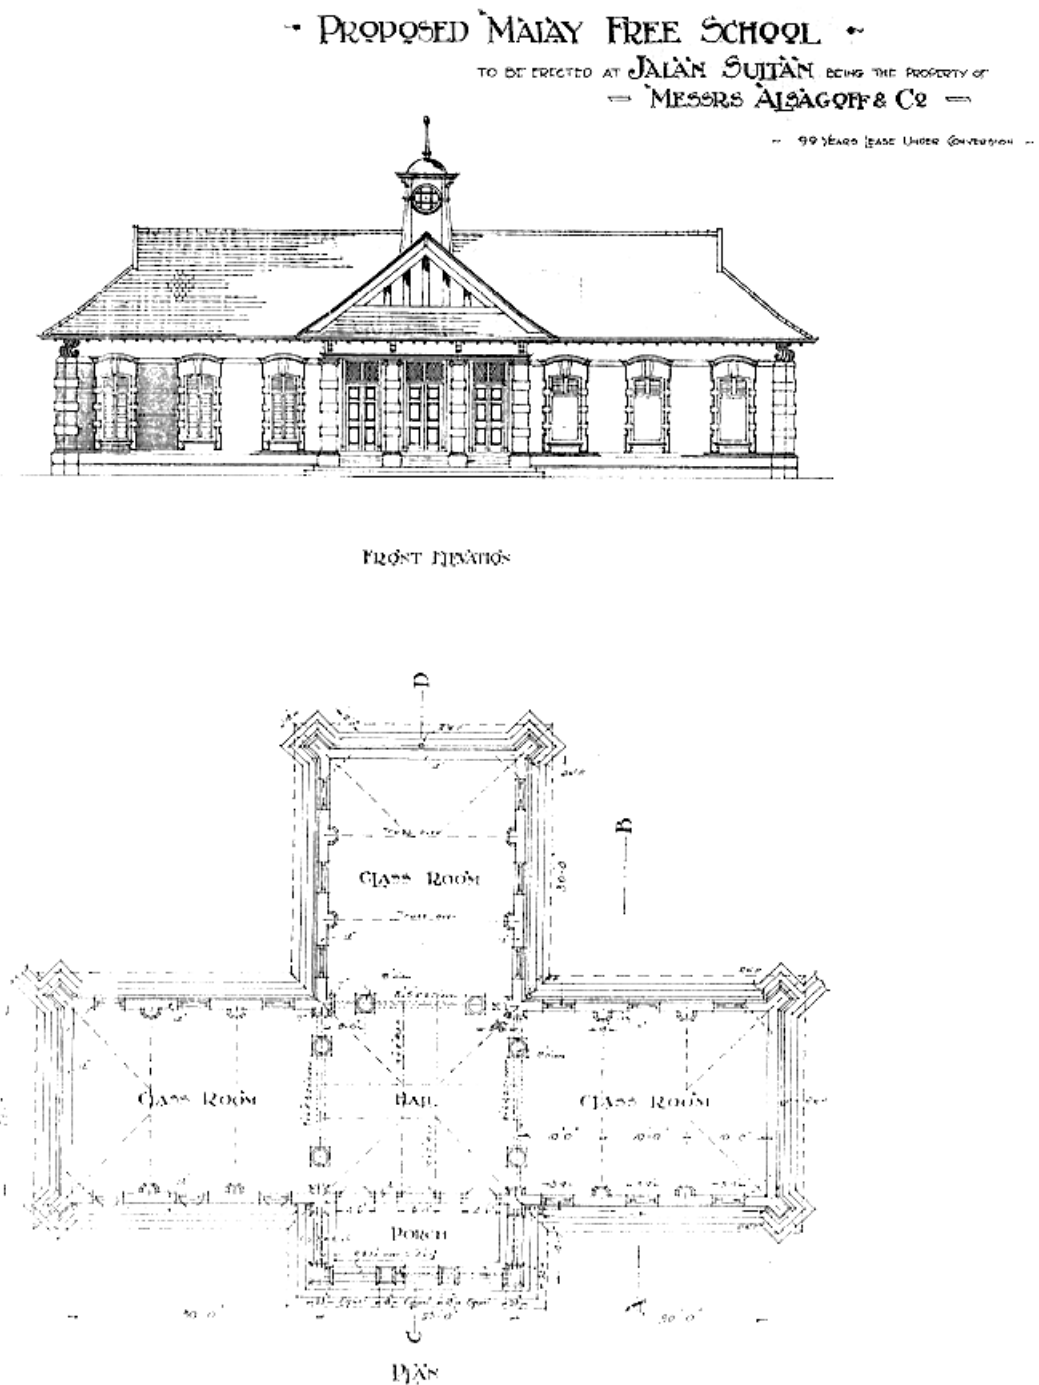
Tomlinson & Lermitt. Plan for the Malay Free School at Sultan Street, 1908. NAS CBS 1128, Building Plan 9197.
